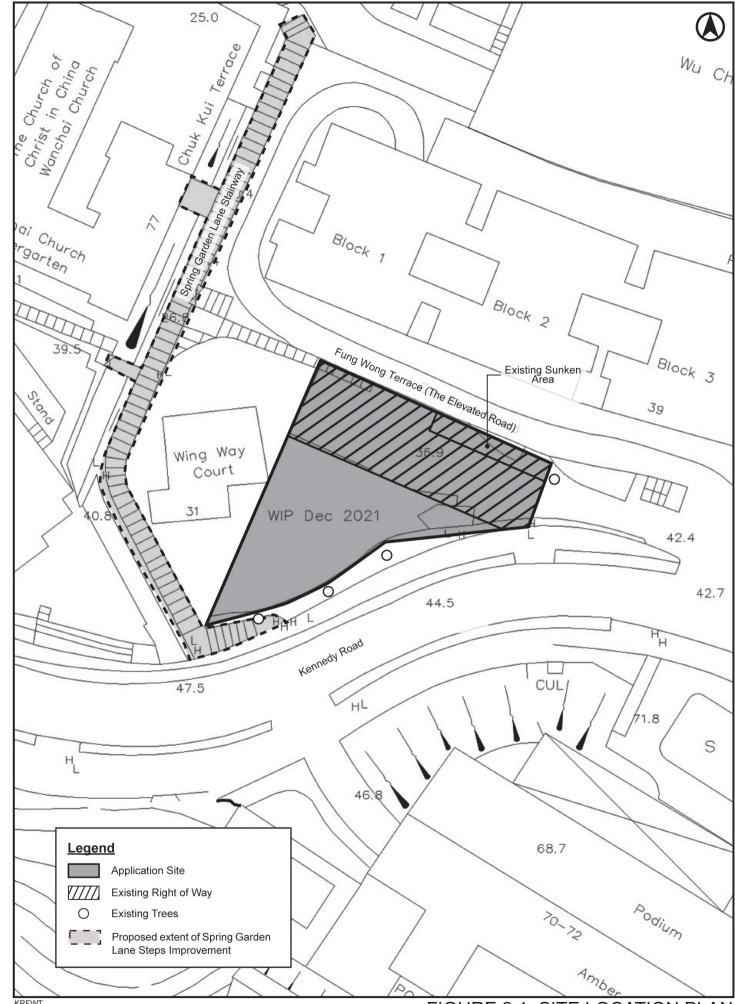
SITE LOCATION PLAN SCALE 1 : 500
